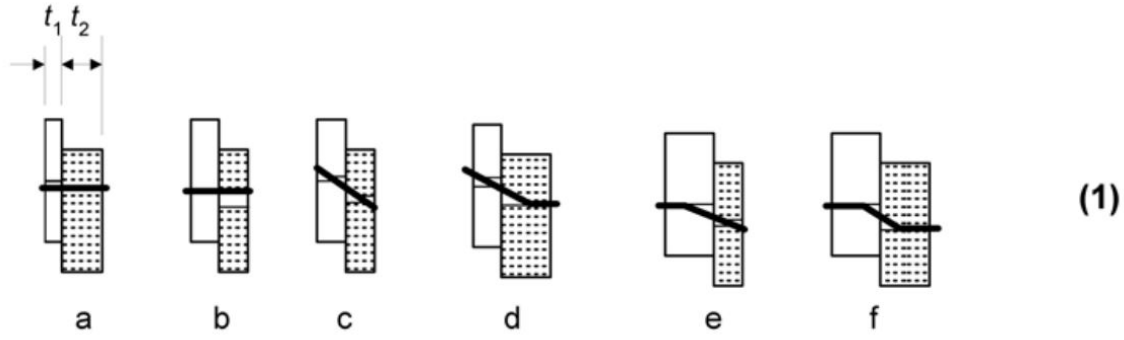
Failure mechanism for glued-in threaded rod in shear
